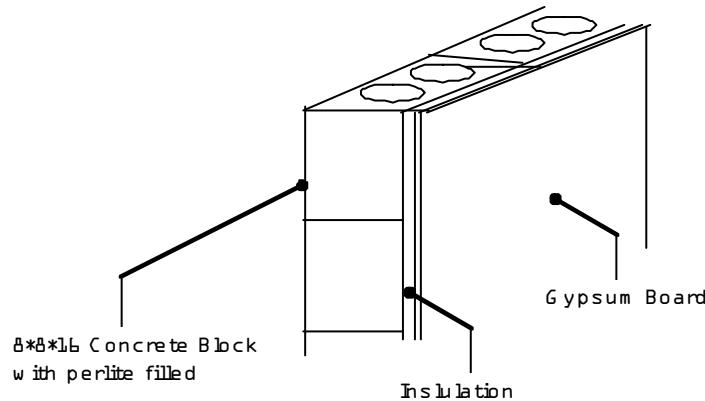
8" block wall with perlite fill (IECC1306.inp).
